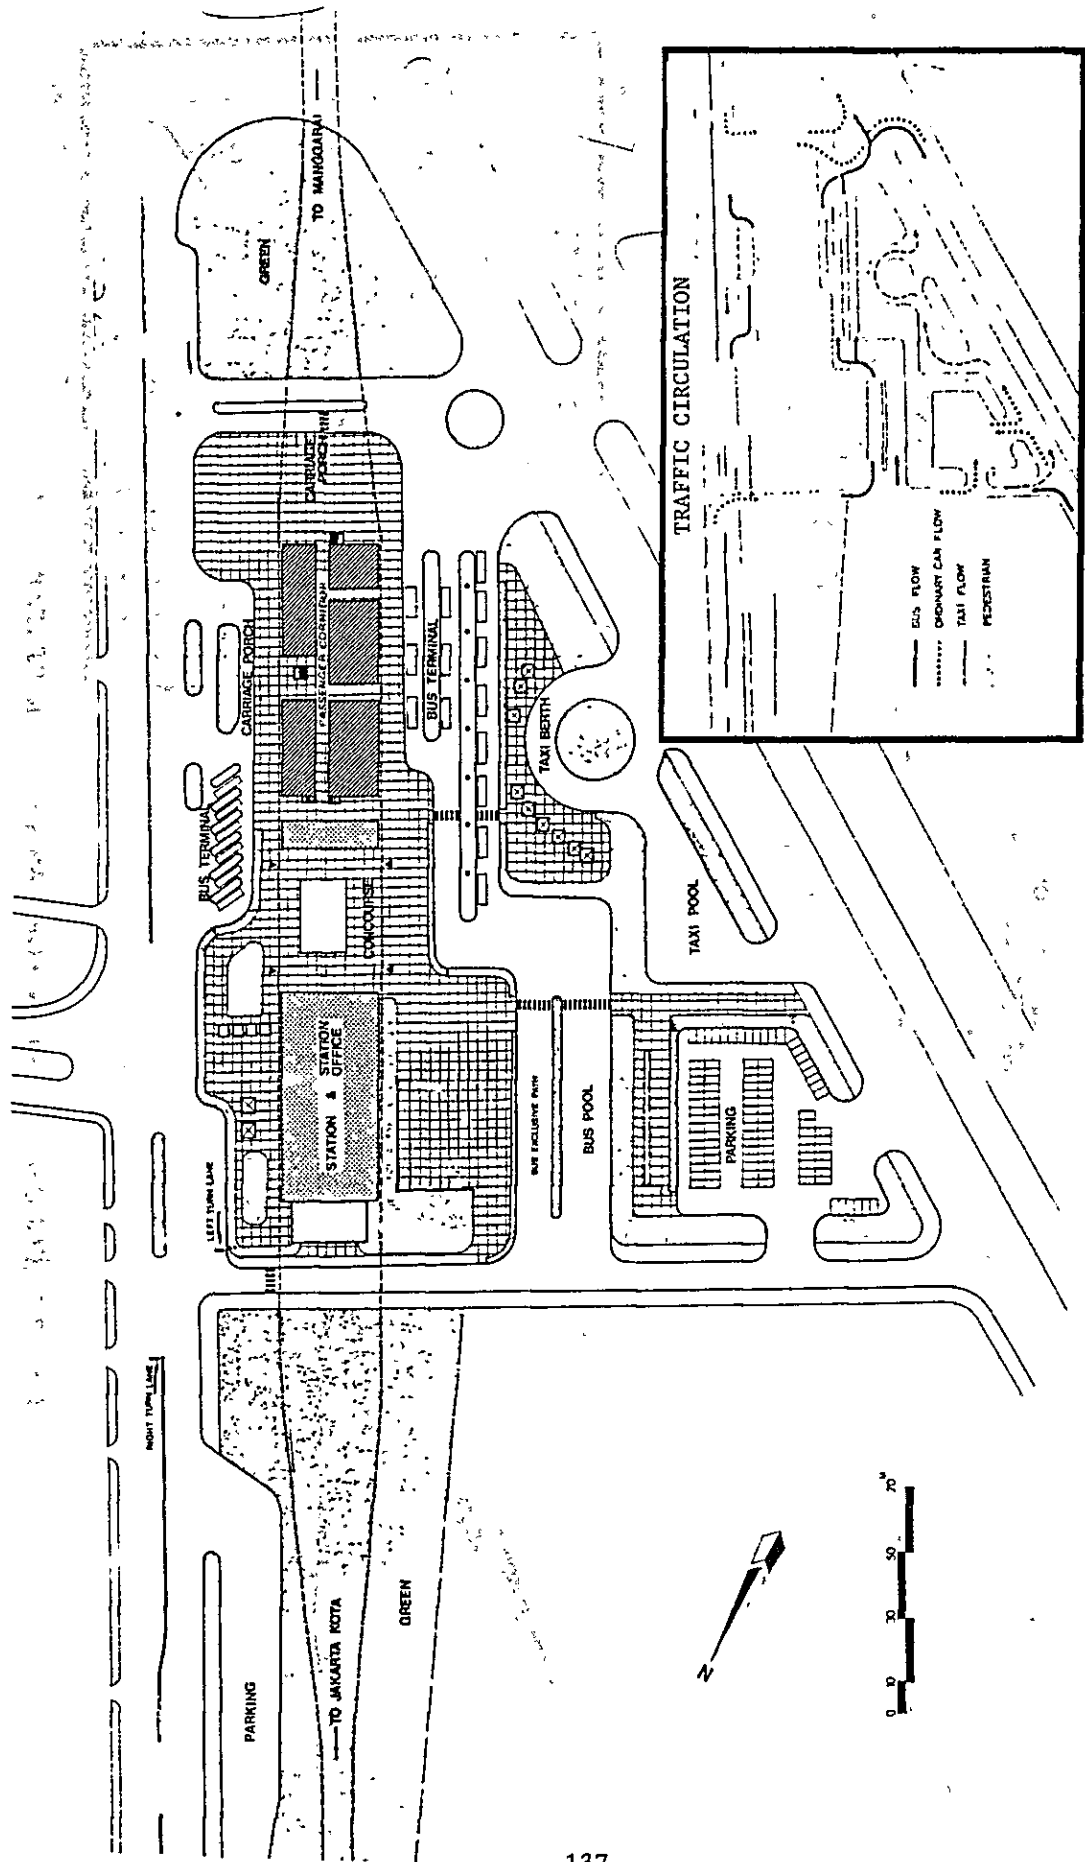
CONCEPTUAL PLAN FOR GAMBIR STATION PLAZA
